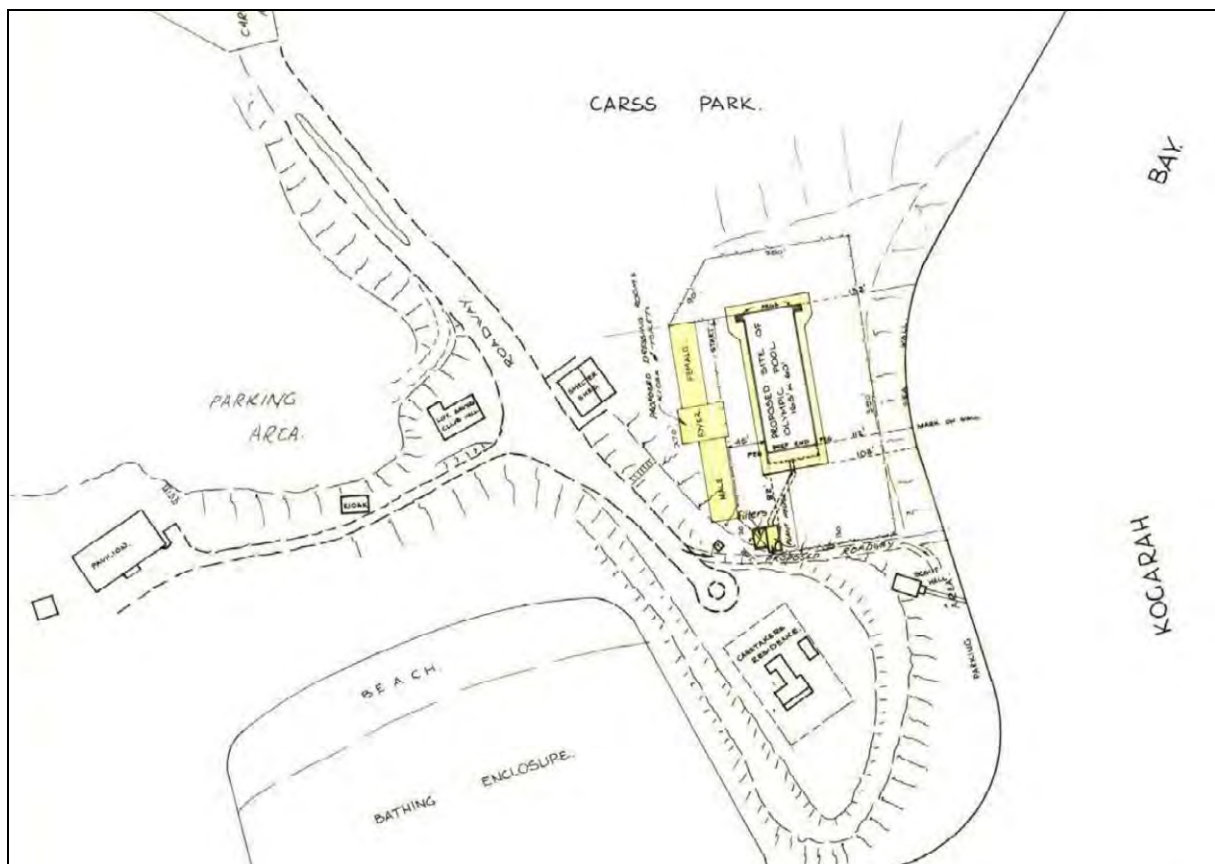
1963 plan showing the proposed location and set out of the pool and surrounding features. (Georges River Council, Plan No. 143A)
